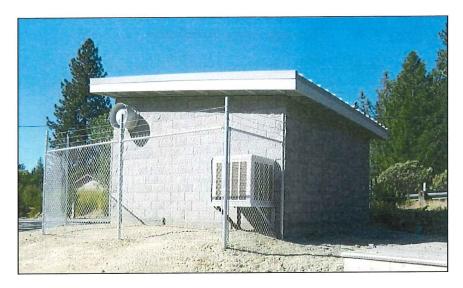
Benson Drive Pump Station at Spring Creek Conduit
